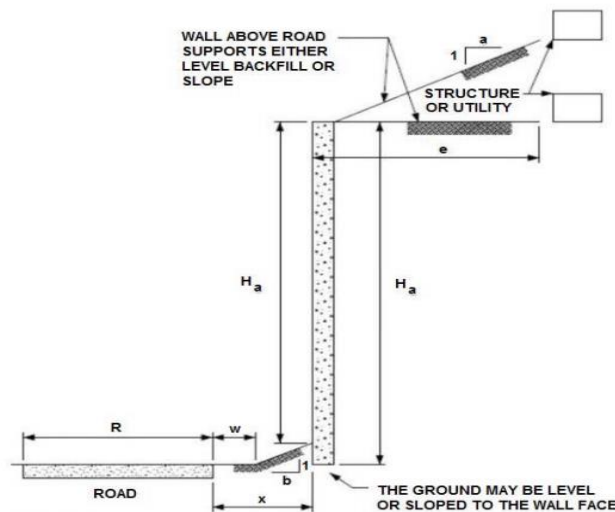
Typical retaining wall geometry (NYSDOT RW Inventory and Inspection Program)
